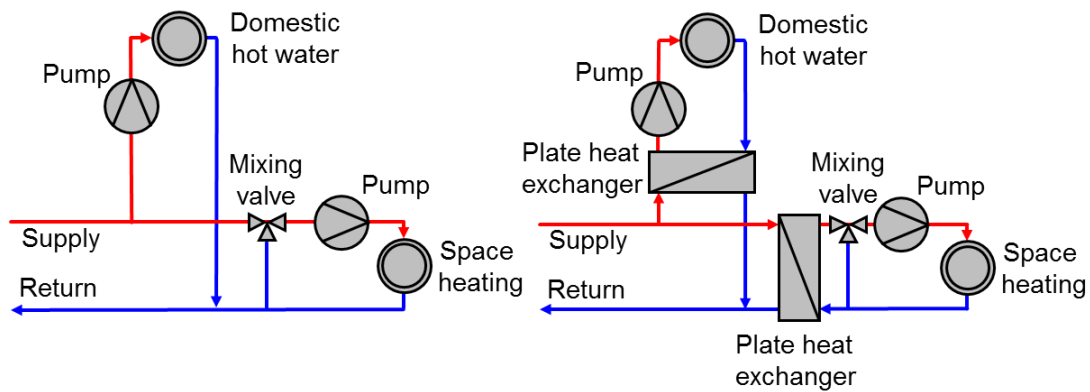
Exemplary substation design: direct connection (left) and connection via plate heat exchanger (right)
